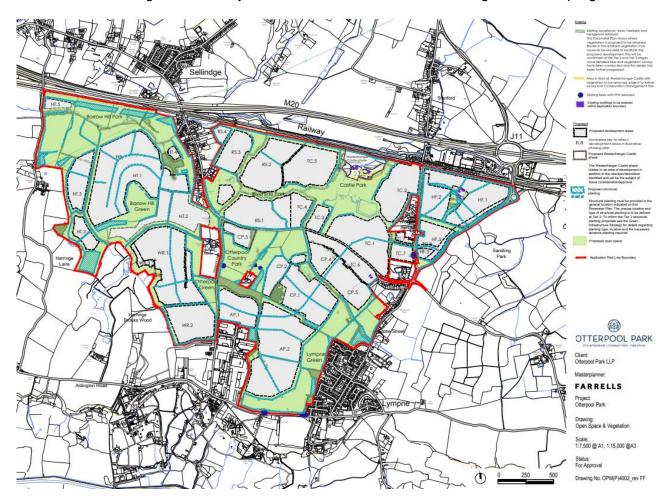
Open Space and Vegetation Parameter Plan showing existing trees and hedgerows to be retained
